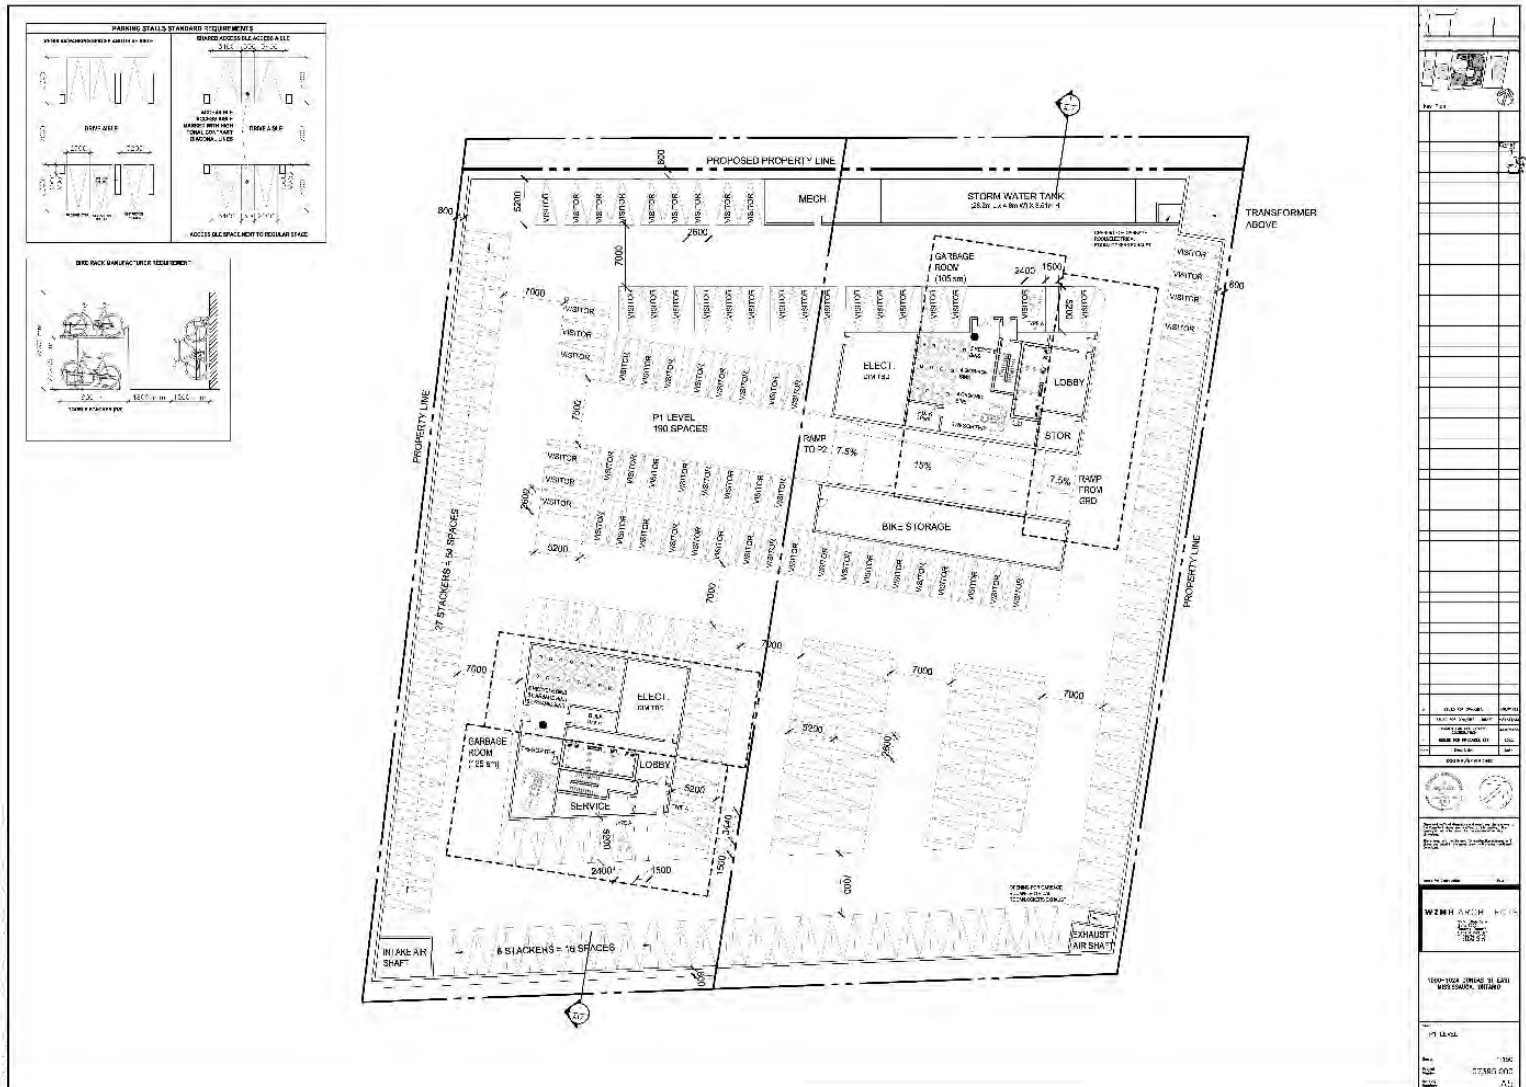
Figure N Parking Level 1 Plan for Proposed Mixed Use Redevelopment for 1000 and 1024 Dundas Street East showing Visitor Parking
